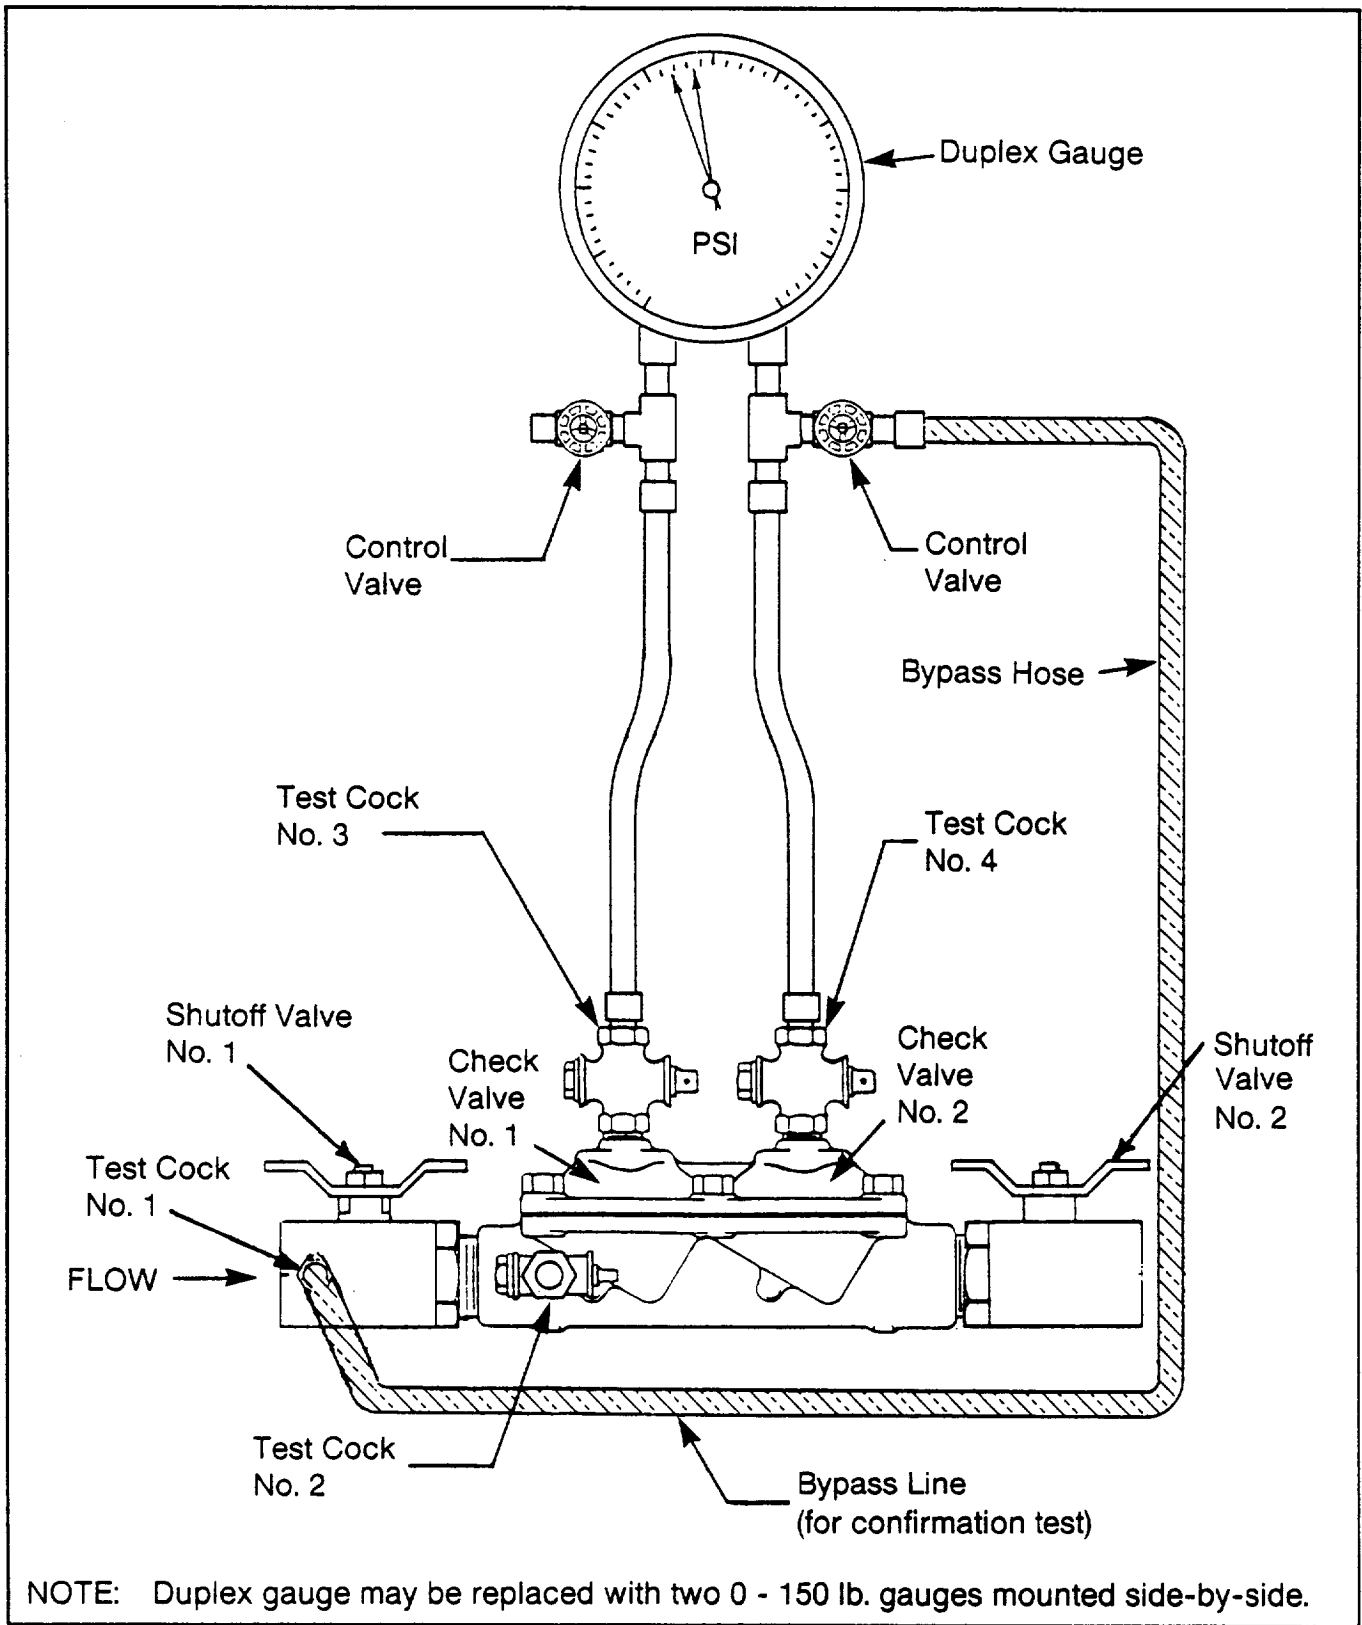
Setup For Testing Double Check Valve Assembly Using Duplex Gauge.
